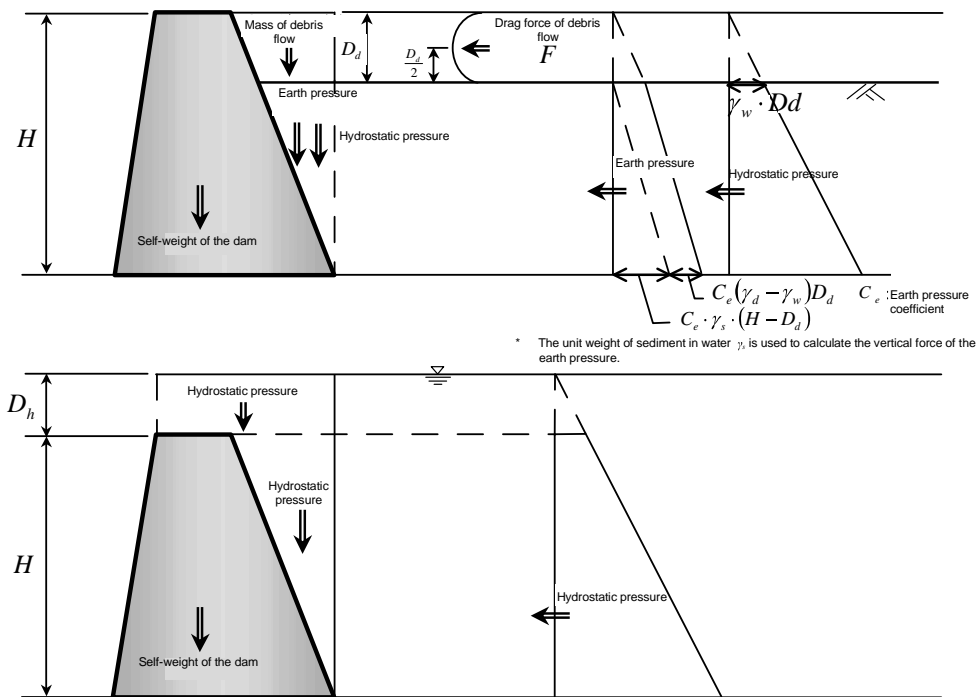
Closed type Sabo dam: design external forces of the overflow section (H < 15 m, Top: during debris flow, Bottom: during flooding)
